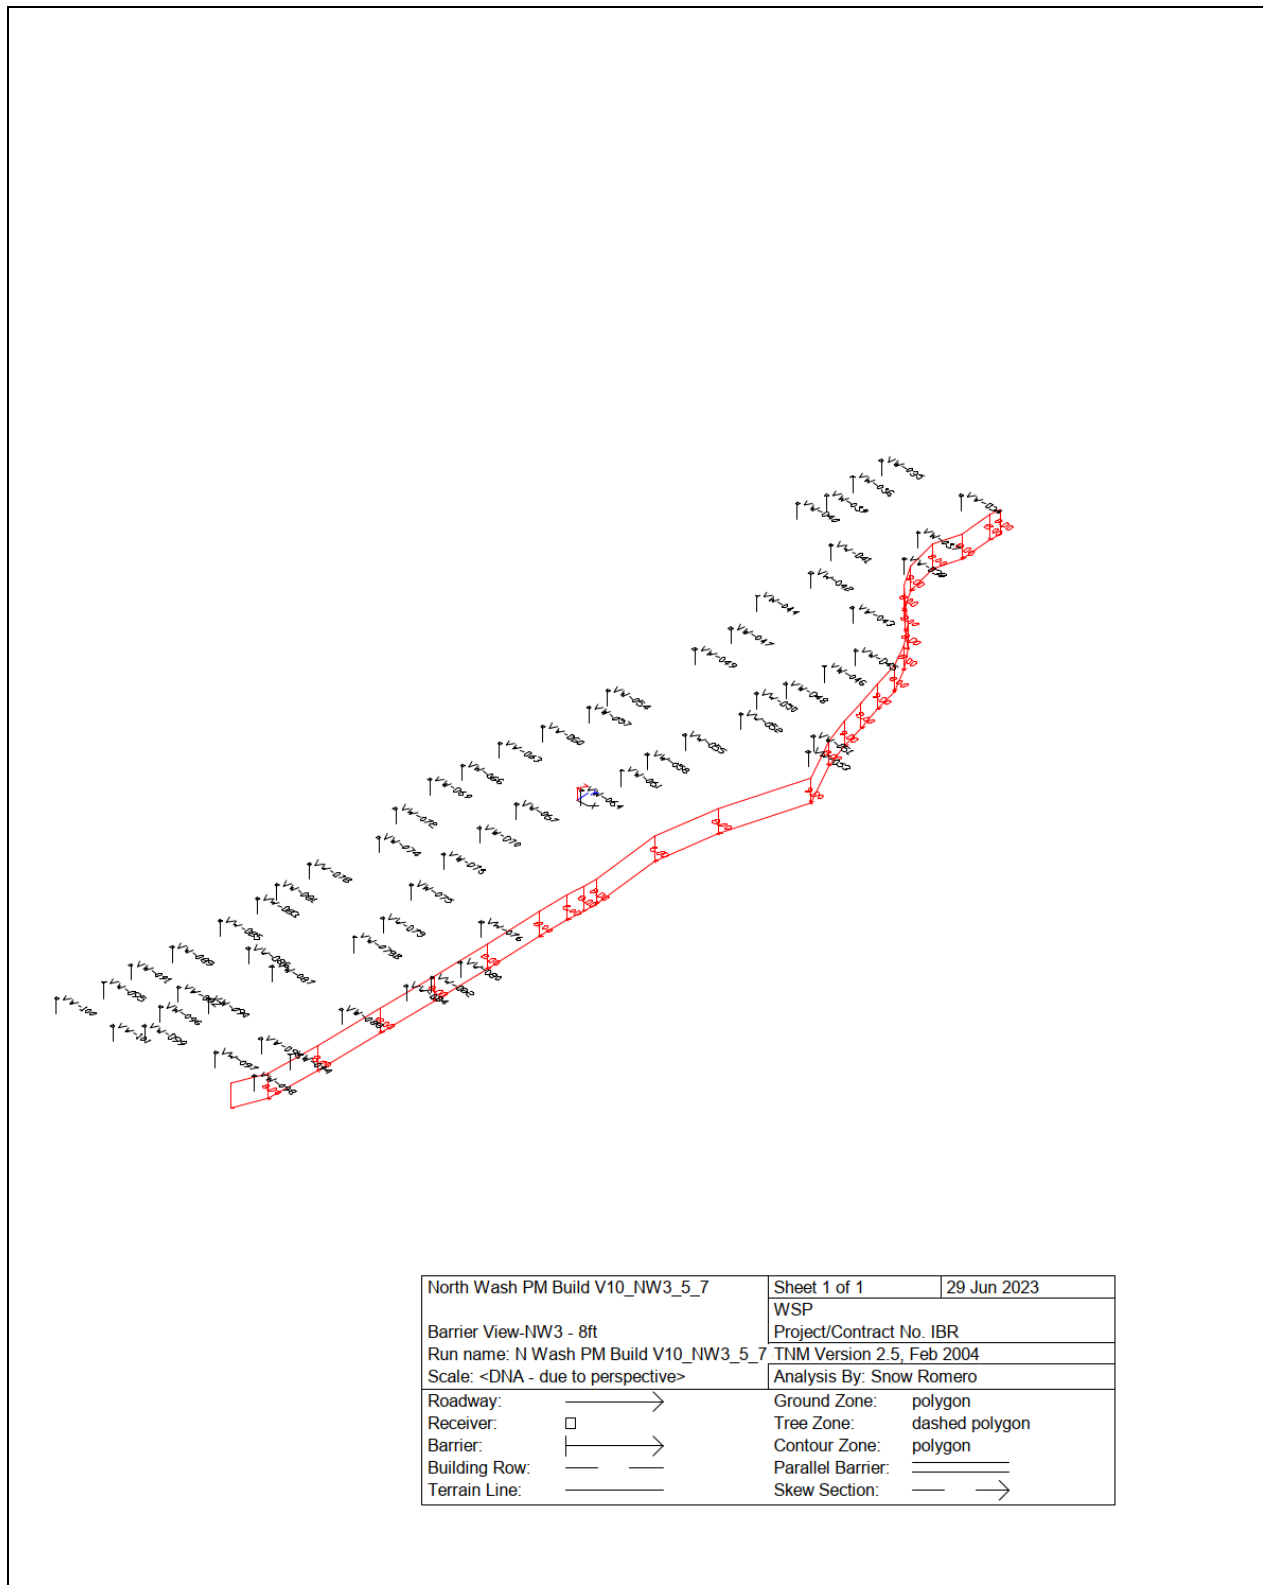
TNM Noise Wall Graphic – Noise Wall 3 (labeled Noise Wall 4 in TNM)
